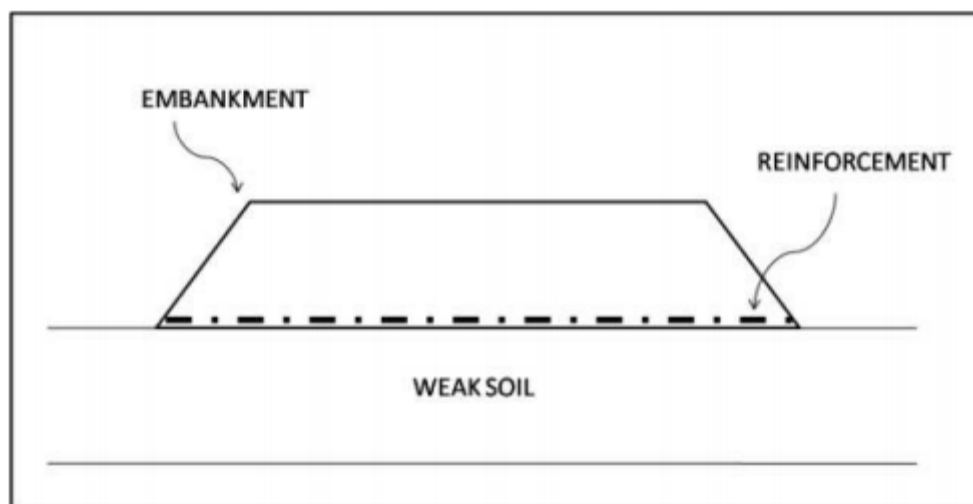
Simple Construction of Embankment over Weak Soil with Reinforcement (Holtz, 2001)
